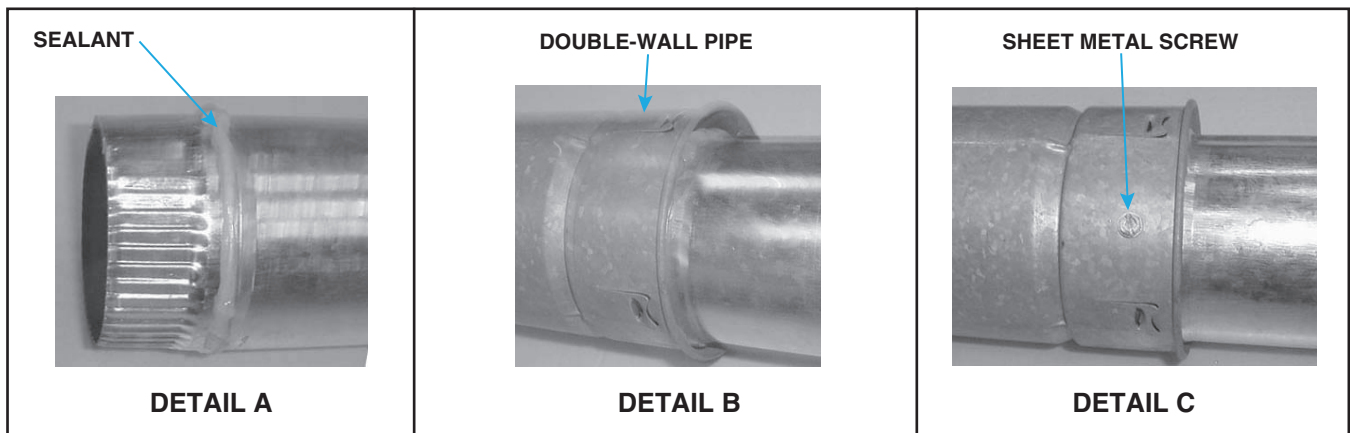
Connecting Double-Wall (Type B) Pipe to Single-Wall or Category III Vent Pipe
